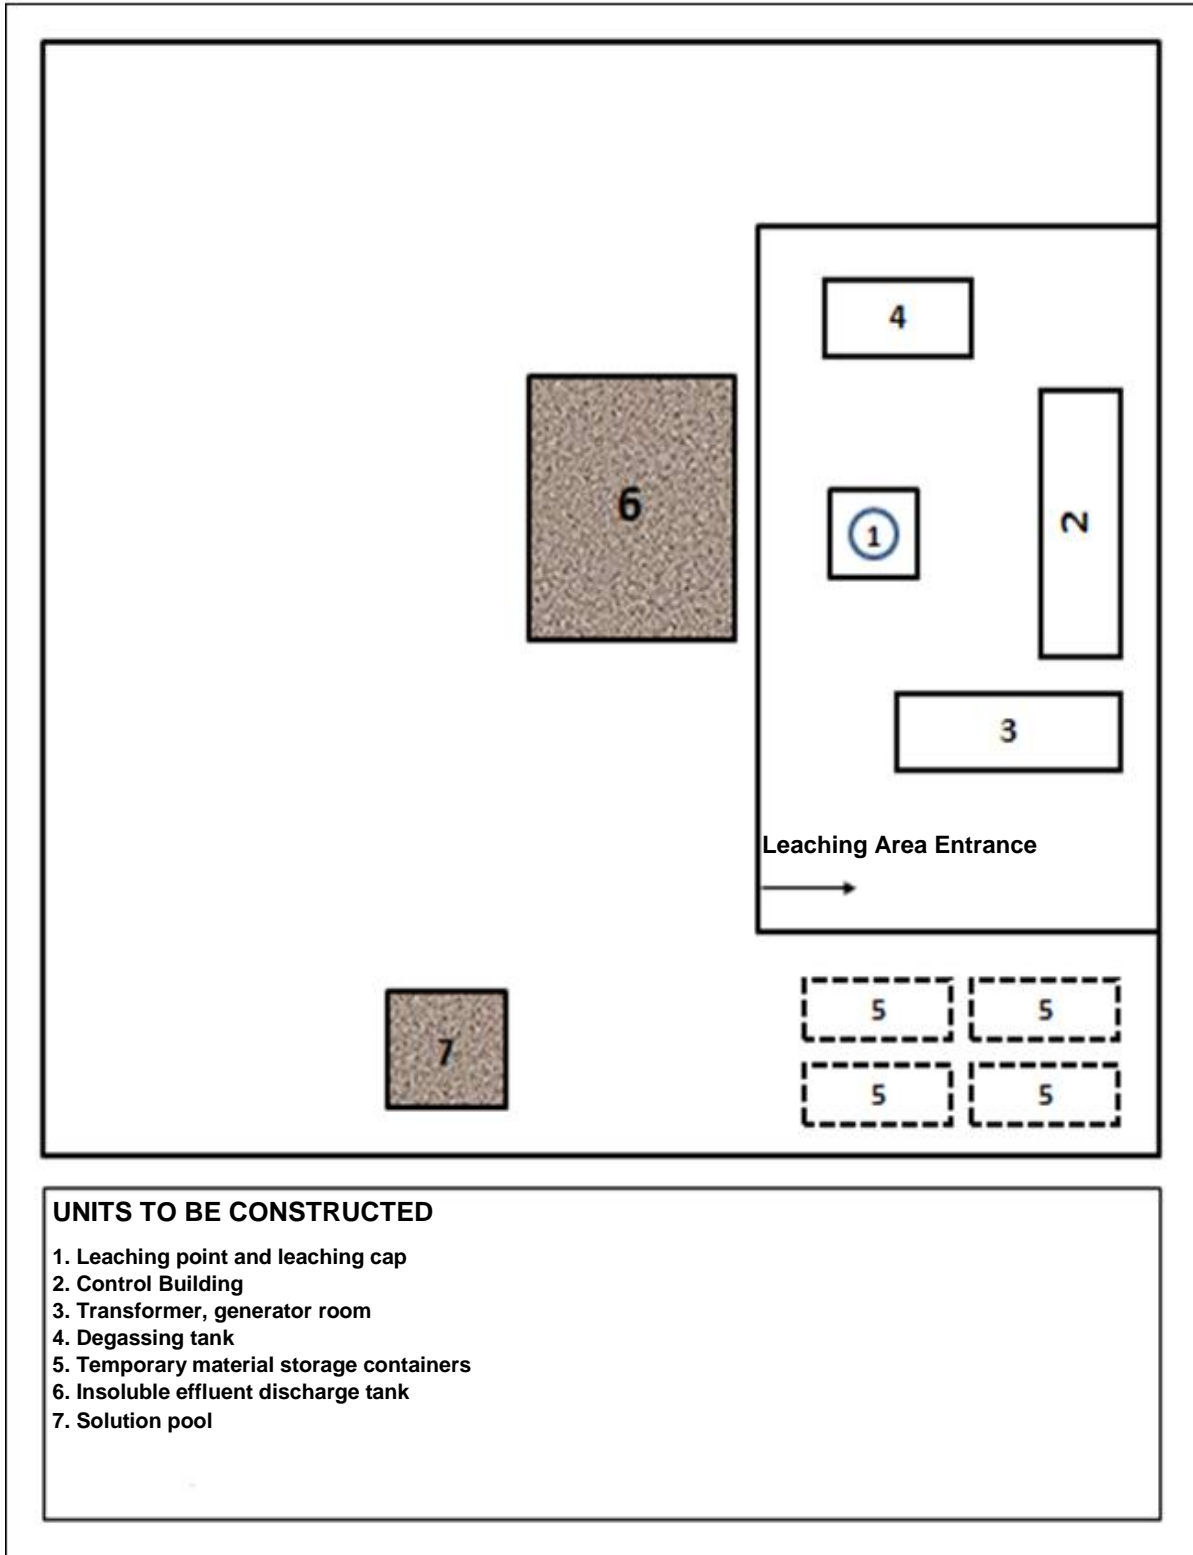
Well Site Layout and Units to be Constructed In Leaching Processes
